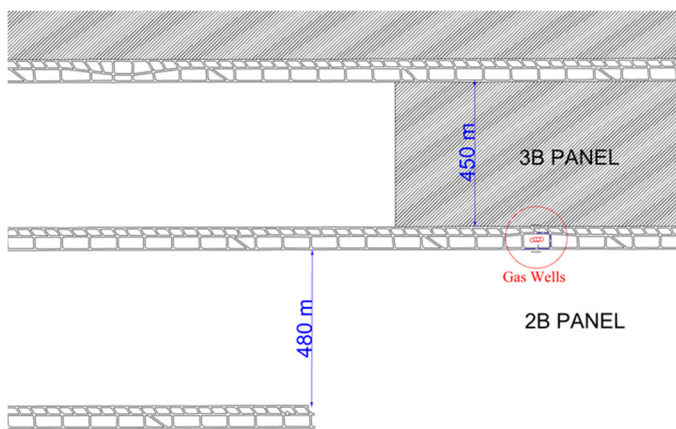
Overview of the longwall layout and the location of the gas wells.
